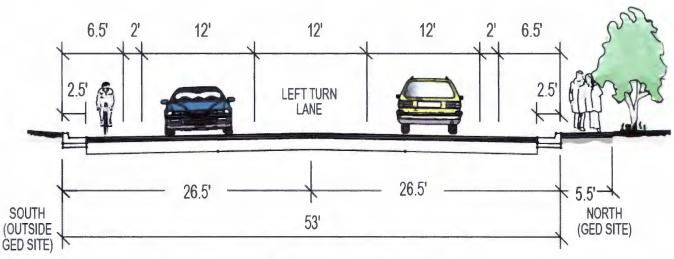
Golden Foothill Parkway Typical Planned Section (with center left turn lane)
